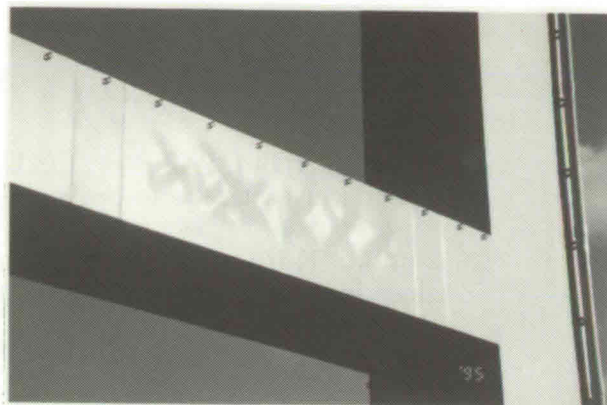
Locally shear-buckled steel rigid-frame bridge pier (Bayshore Route, Shin Ashiya River Bridge)
